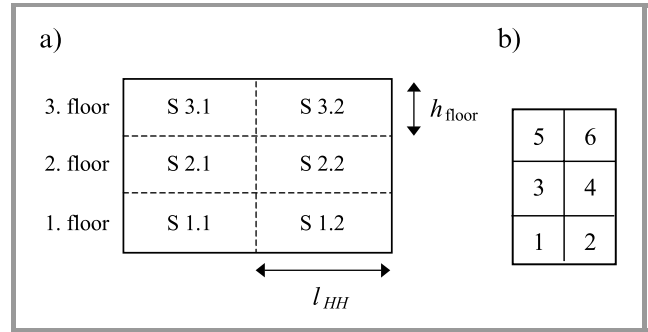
Front sight of a single building wall (a) divided into floors and sections as well as the corresponding ground plane of the building with 6 households per floor (b).
